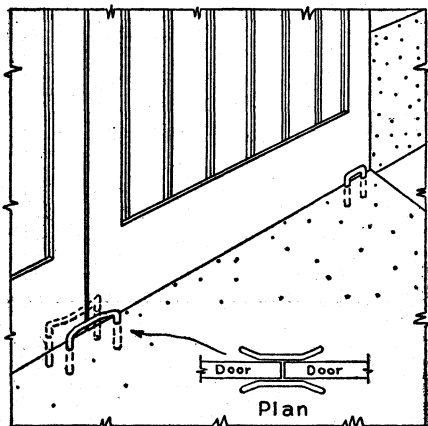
Substantial homemade sliding door stay made from 1-inch iron rod
